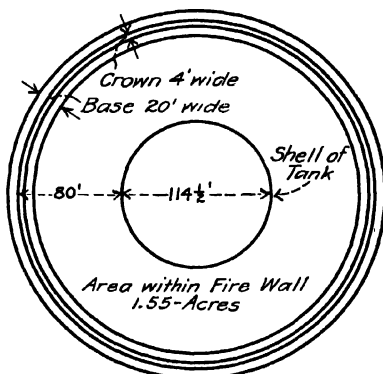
Illustrating position of fire wall about oil storage tank.
